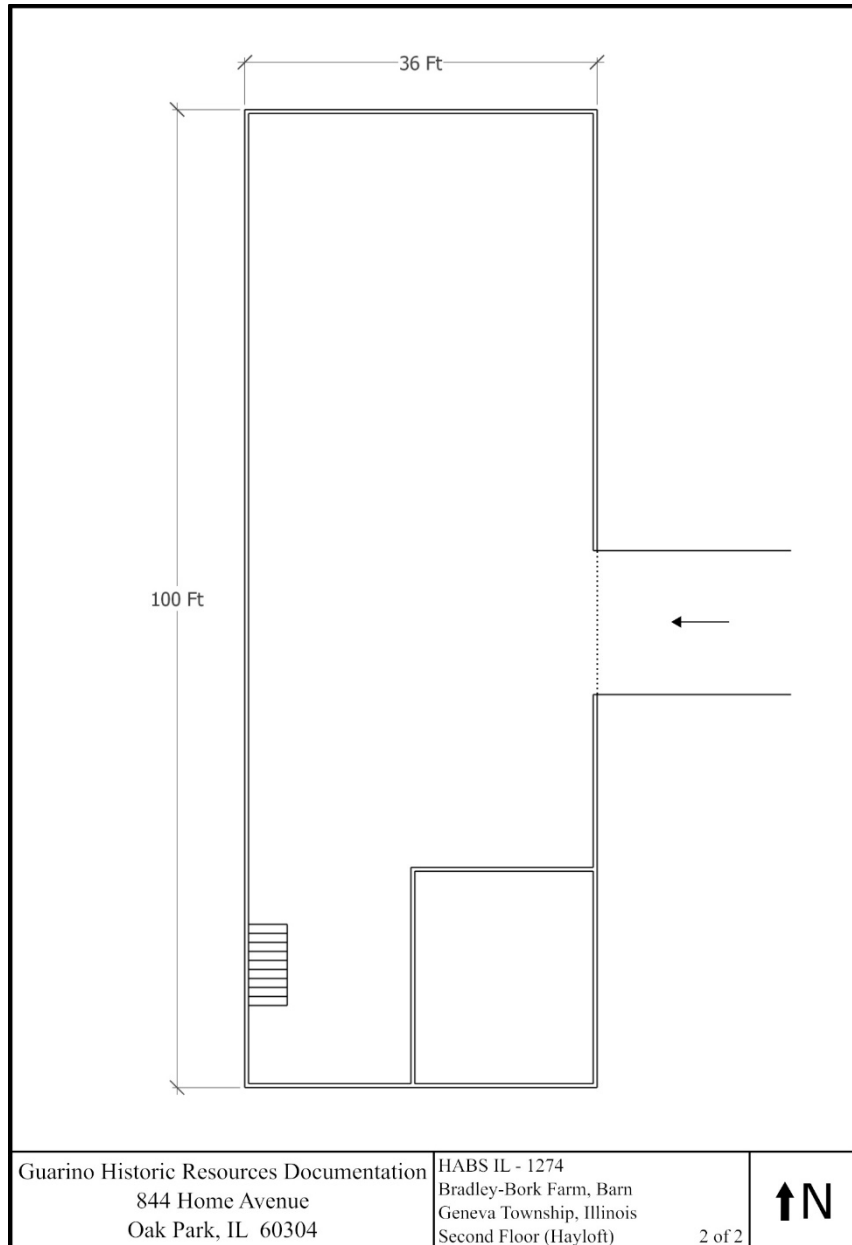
Second Floor (Hayloft) Plan of the Bradley-Bork Farm Barn,
